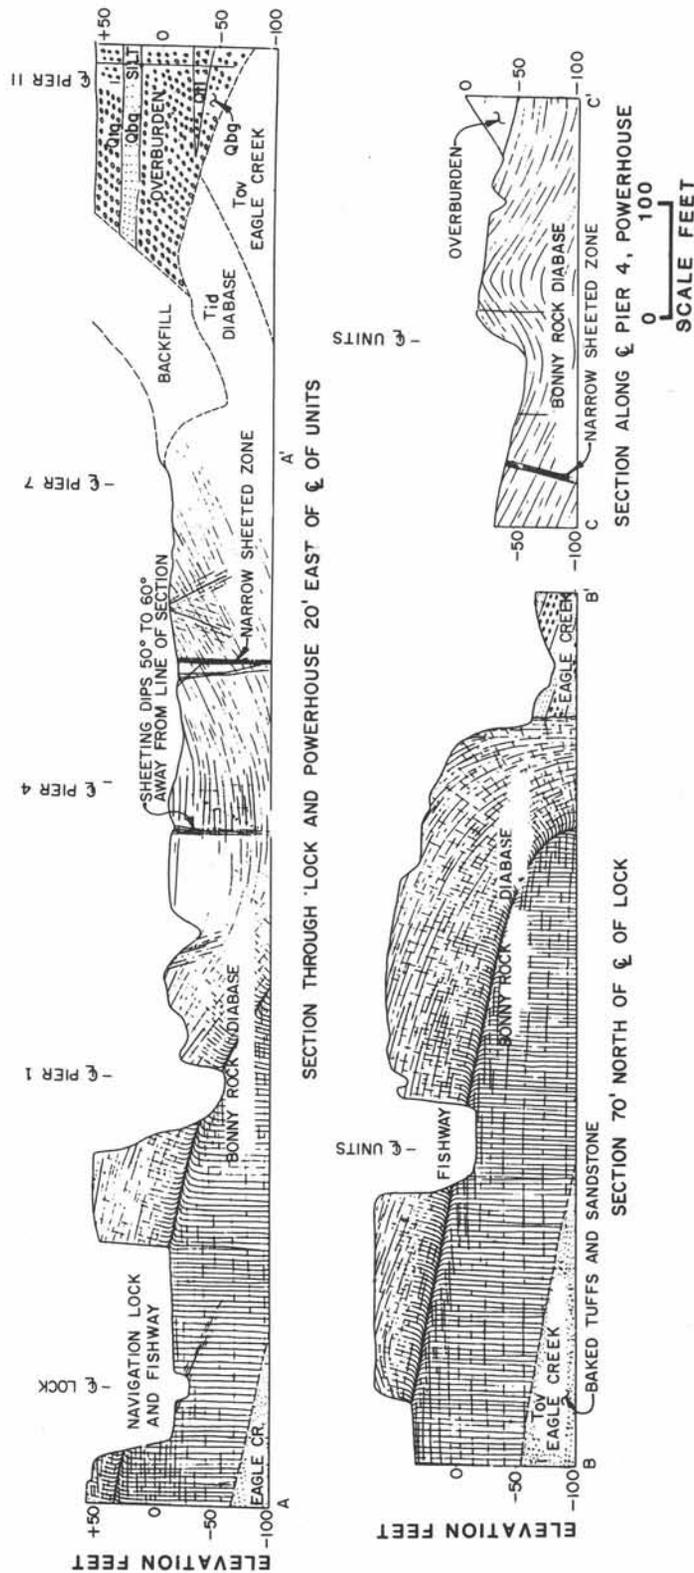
Geologic sections through the first powerhouse and original navigation lock, Bonneville Dam. Upper section is 20 ft east of the center line and is a view downstream. The lower section is a view north to the Washington shore. Strata labelled Eagle Creek on this figure were later termed Weigle formation. From Holdredge (1937).
